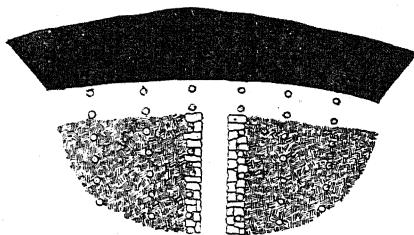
Plan illustrating pillar work and gob packing with a weak roof.
